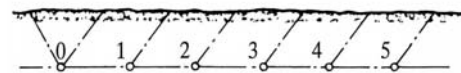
15. Firing pattern for single-row blast. Hole spacing 10 - 50% greater than burden.
